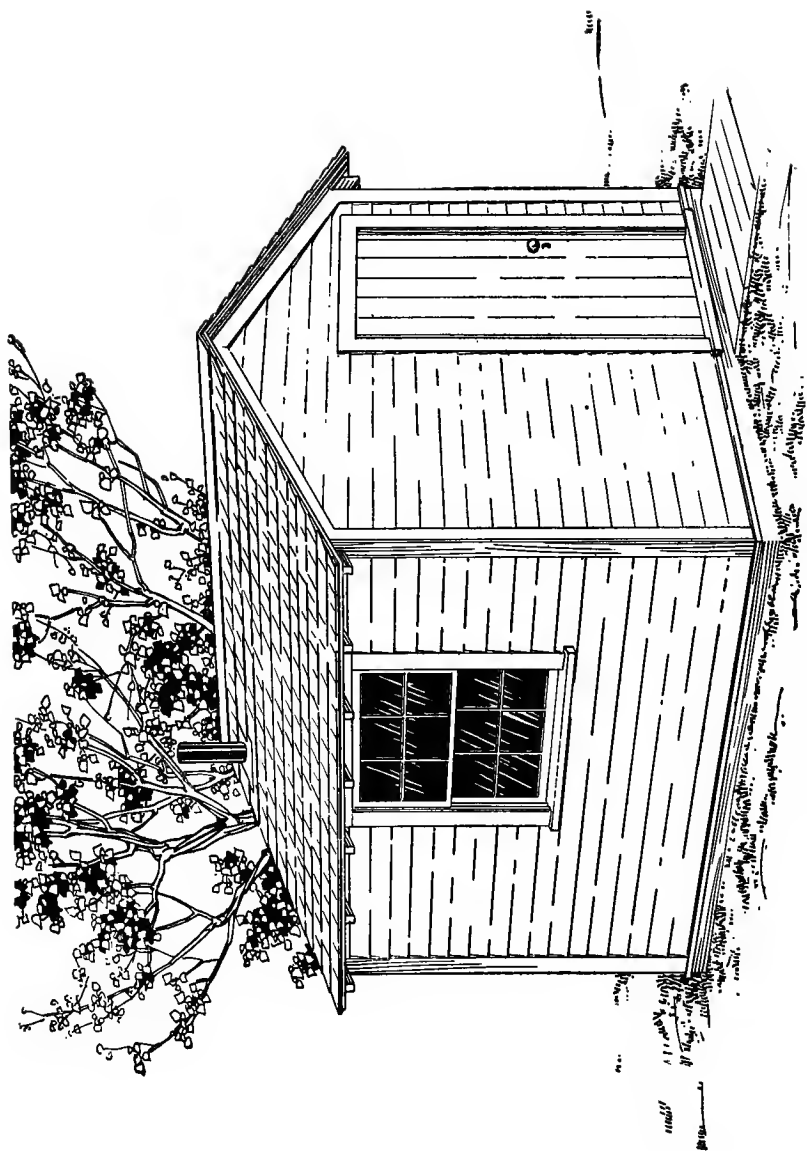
A Back-Yard Workshop with a Gable Roof.
